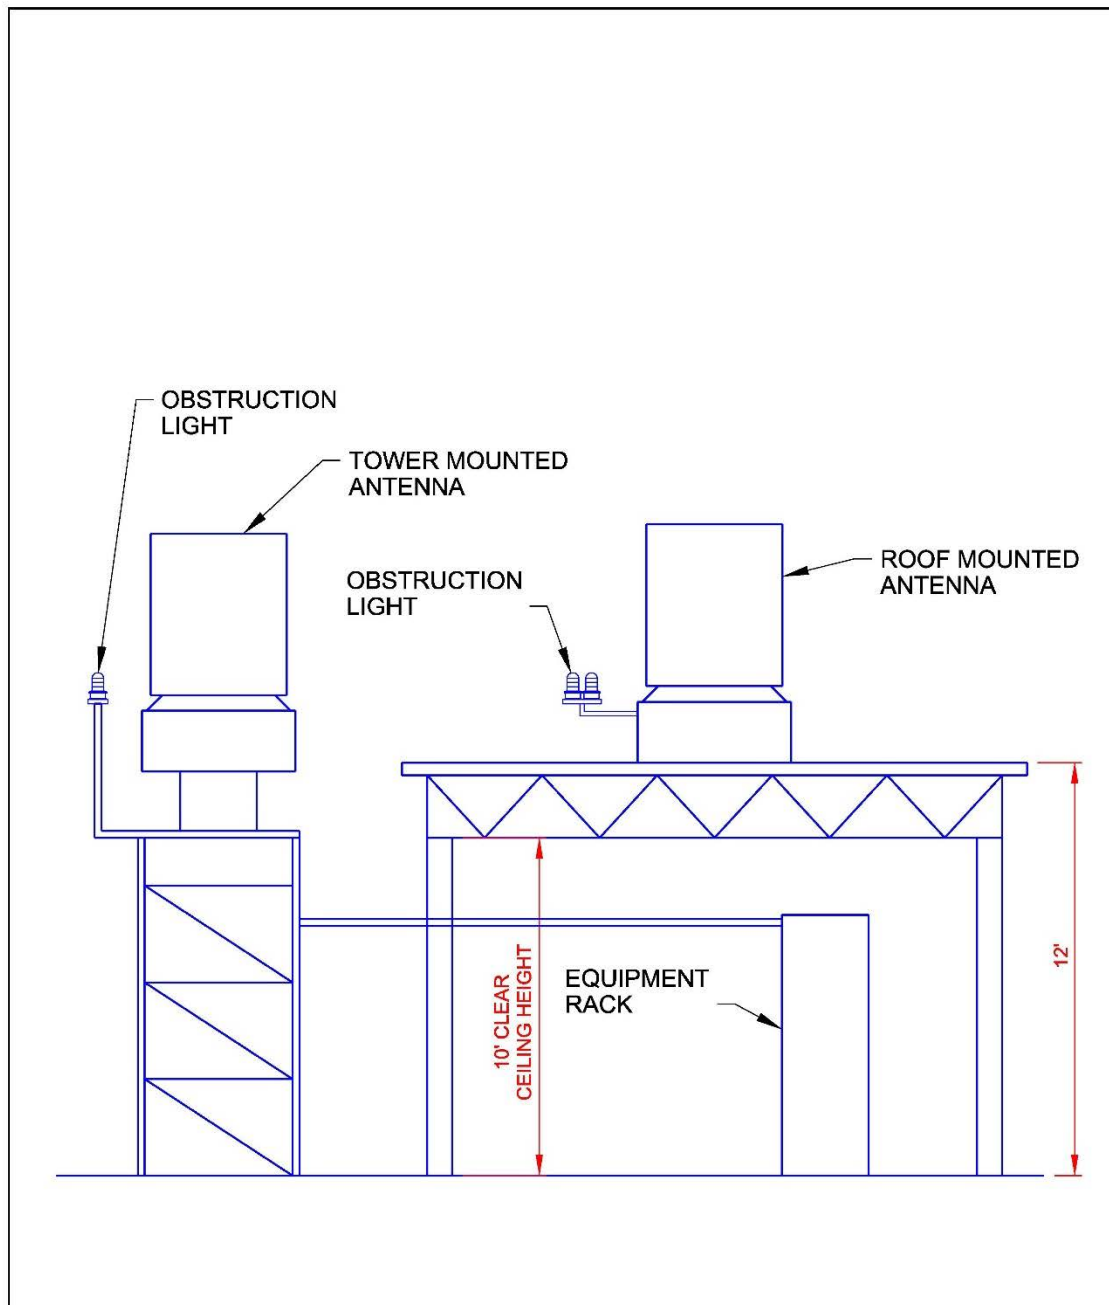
Typical Shelterized TACAN Antenna with Adjacent Electrical Shed
